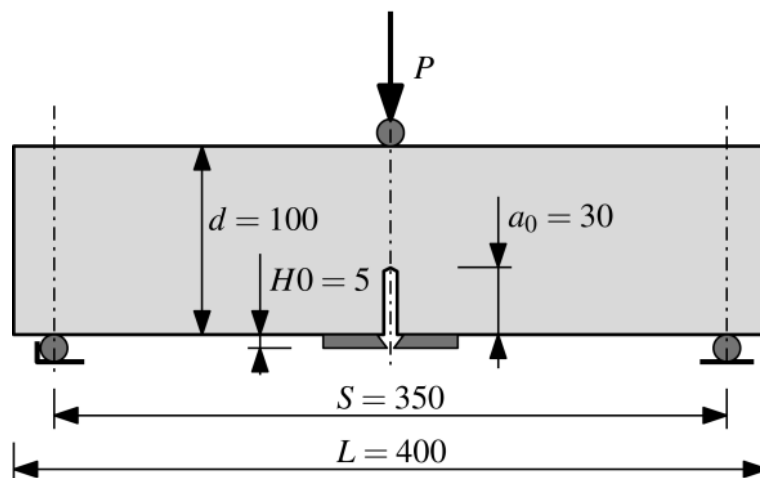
Fracture testing configuration and geometry of notched specimen.
